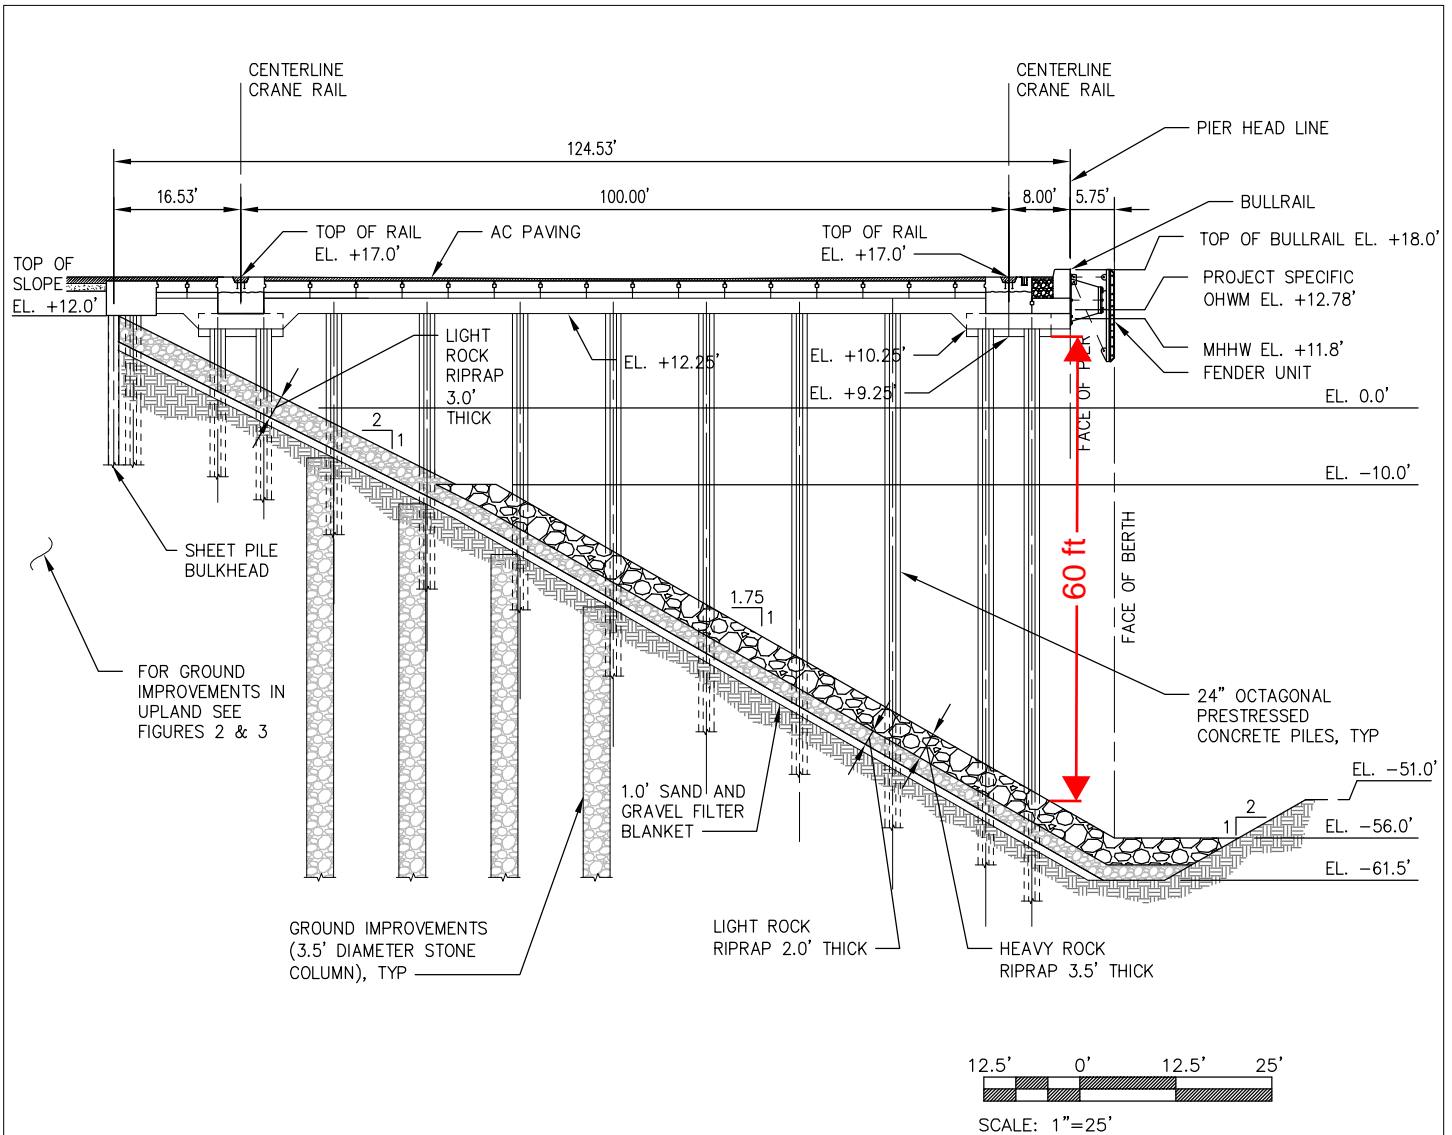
DREDGE AND SLOPE PROTECTION PLAN
